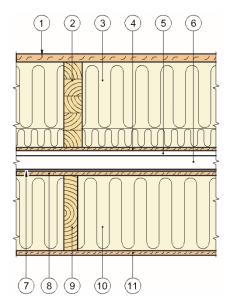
shows the principle design of floors above foundations. The floor elements have longitudinal main beams (edge beams) on each side, and transvers floor joists. Beams and joists are designed according to structural calculations in each individual case for the relevant loads and span.
